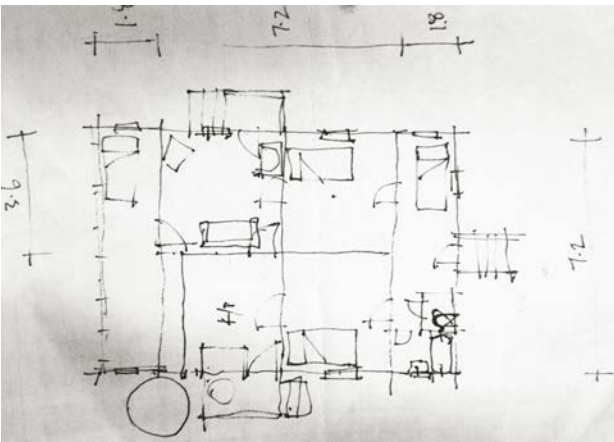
Stage 1 floor plan sketch by Archie Moore & Kevin O’Brien, Image: courtesy of Samstag
